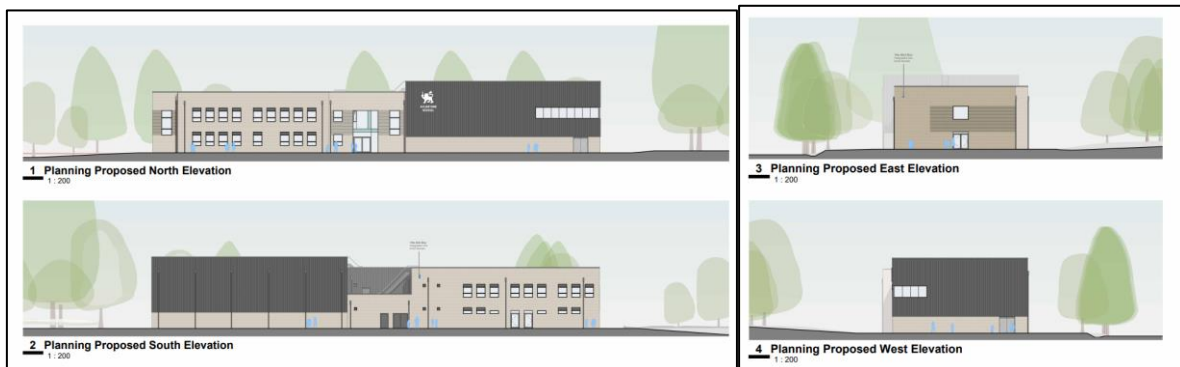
Proposed General Arrangement Building Elevations – Rev P04 (10/09/25)
